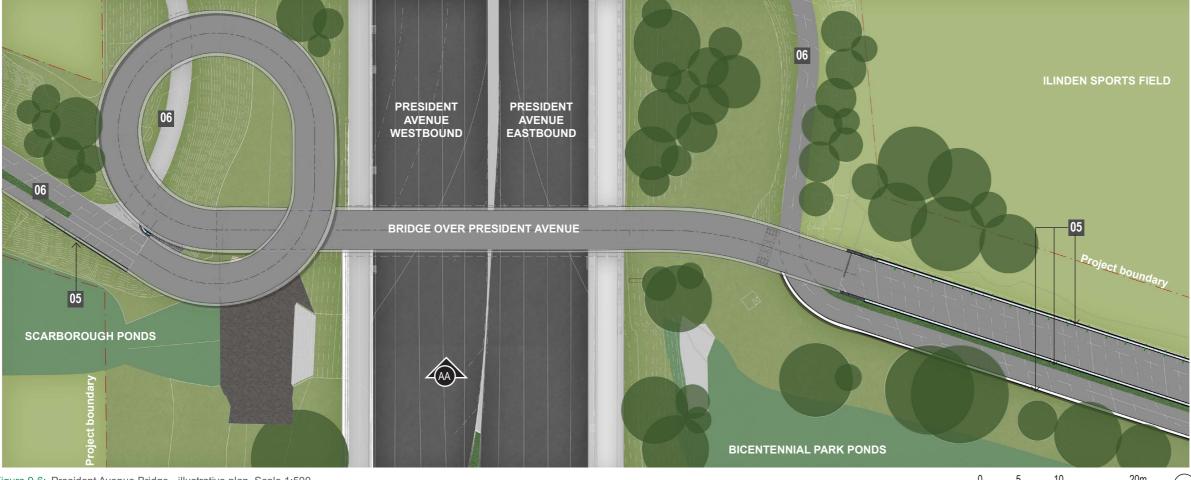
President Avenue Bridge - illustrative plan. Scale 1:500
